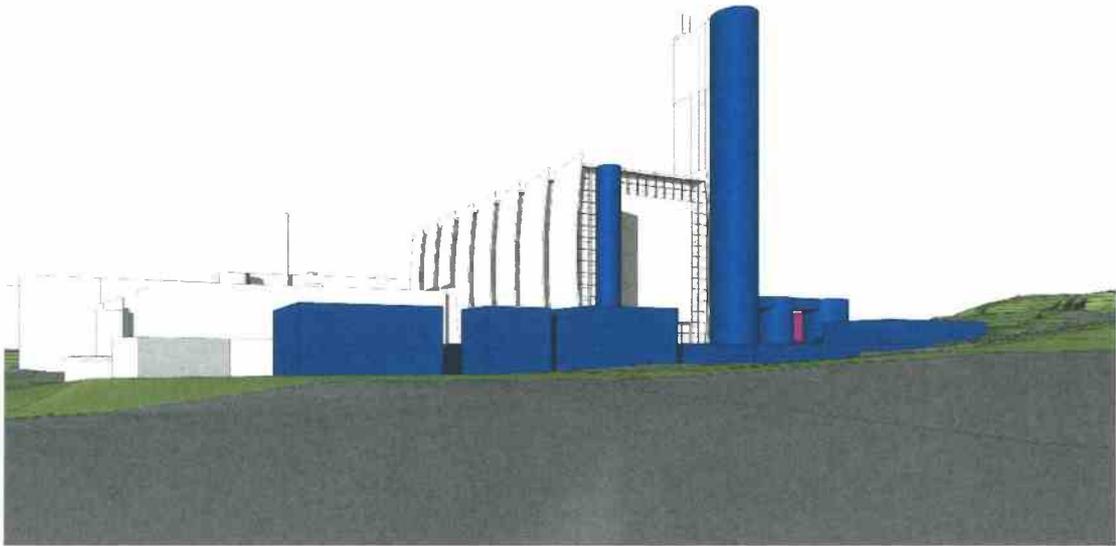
CC-plant at Klemetsrud WtE plant. View CC plant from main road (E6).
